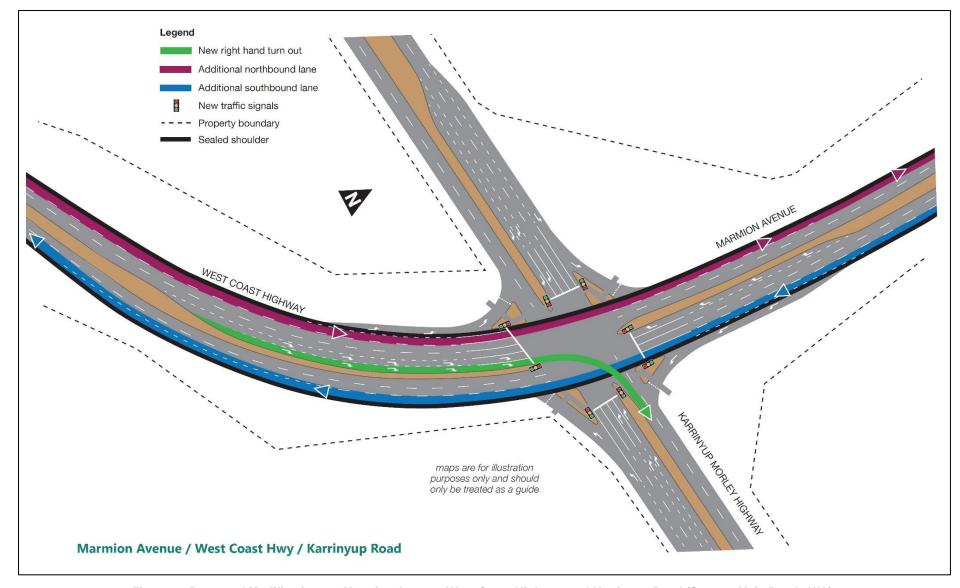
Proposed Modifications at Marmion Avenue, West Coast Highway and Karrinyup Road (Source: Main Roads WA)
